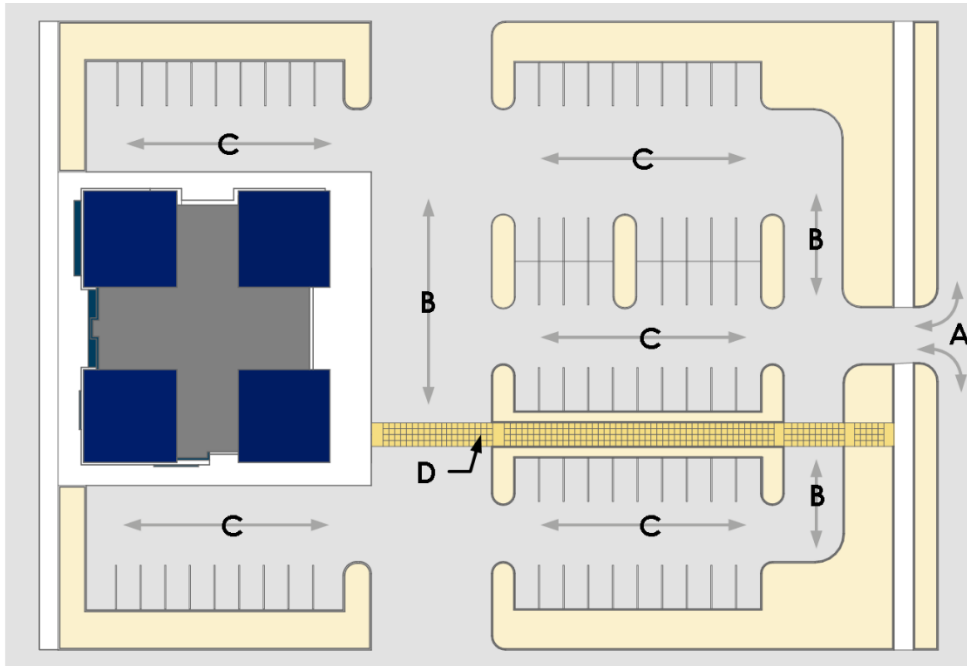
A. Parking Area Components. (A: Driveway Apron; B: Driveway; C: Access Drive; D: Pedestrian Walkway)
